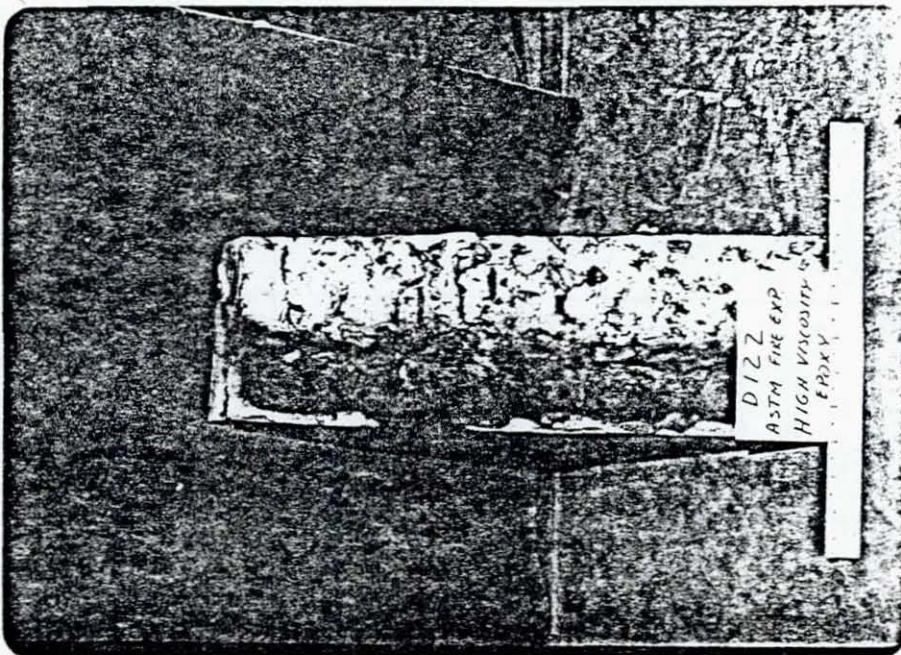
Failure pattern for 6 in. Thick Specimen, High Viscosity Epoxy and ASTM E-119 Fire Exposure.
